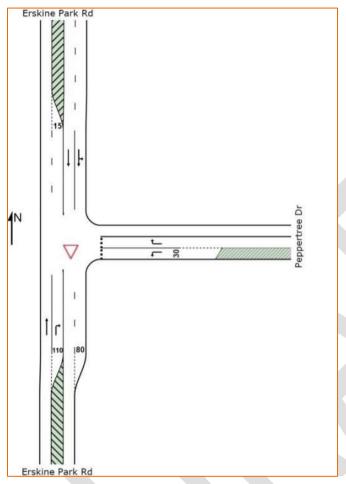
Existing Intersection Layouts assumed in the SIDRA models
